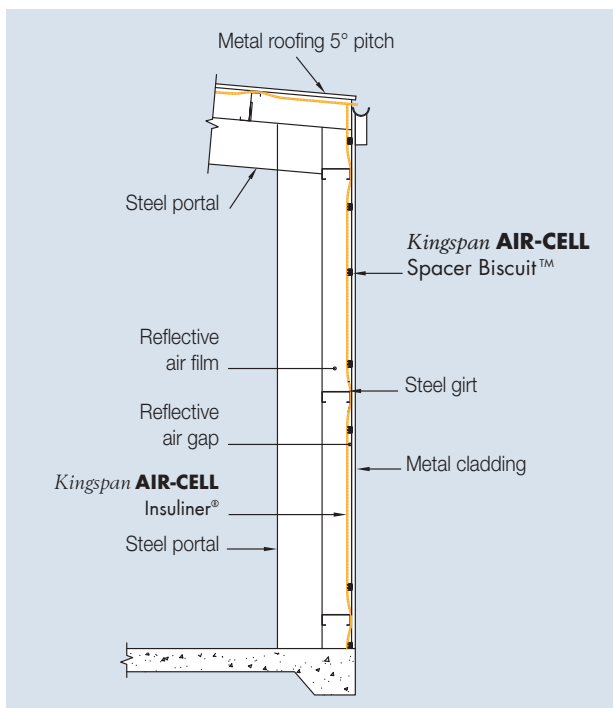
Side elevation of Kingspan AIR-CELL Insuliner® in a warehouse wall
